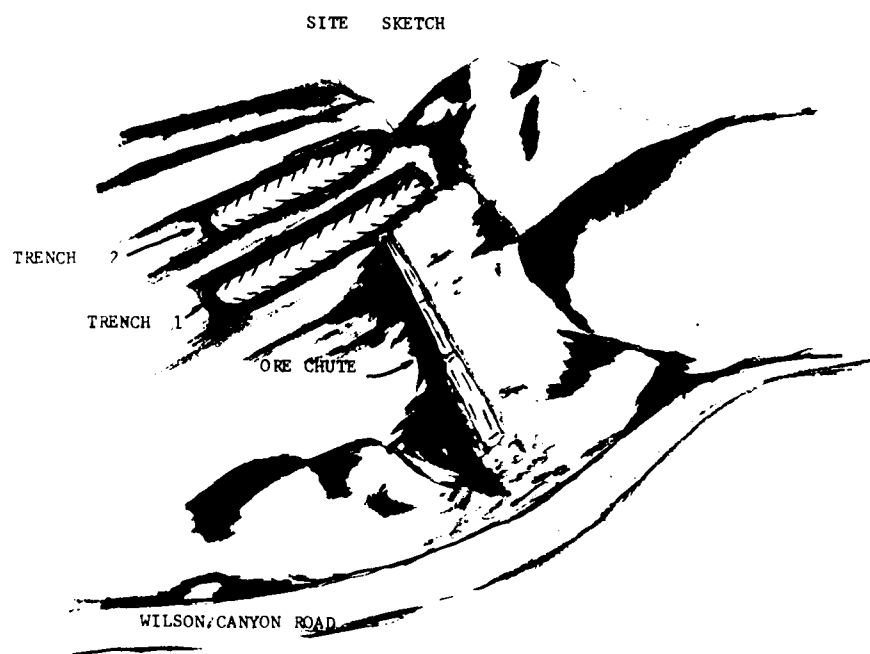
Site sketch showing trenches and ore chute at site N-1732.
